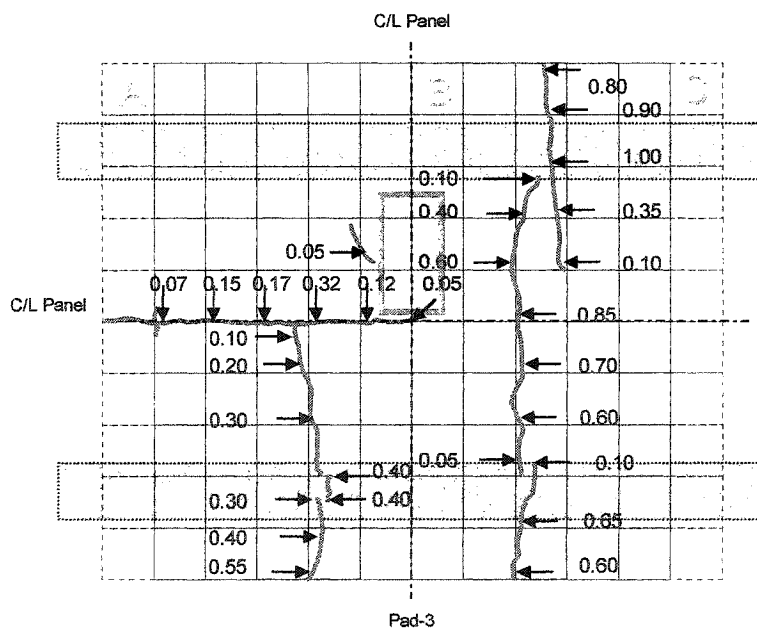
Panel-B: Crack Pattern on Top after 900 Load Cycles
